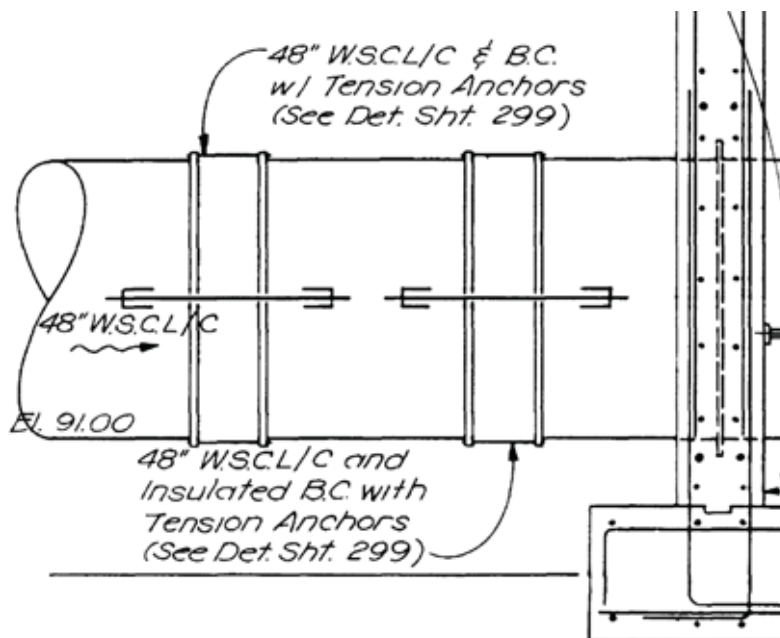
Typical double flexible joint with bolt harnesses. Detail on Meter Pit No. 4.
